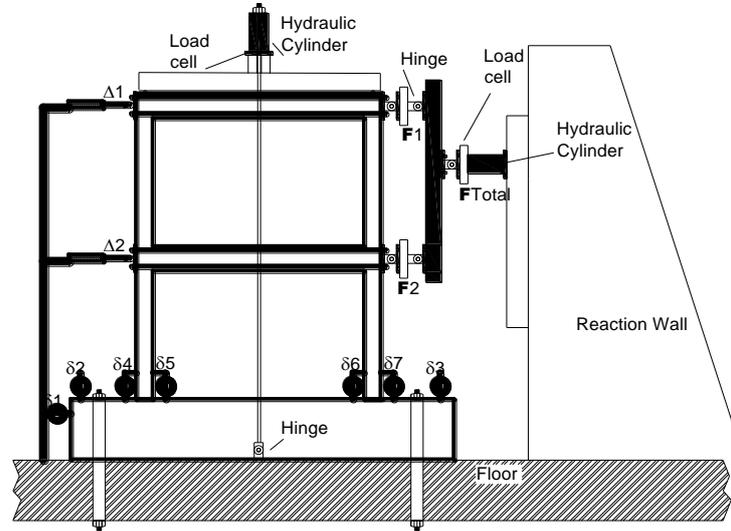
Test setup, loading system, and instrumentation (Korkmaz *et al.* 2010)
